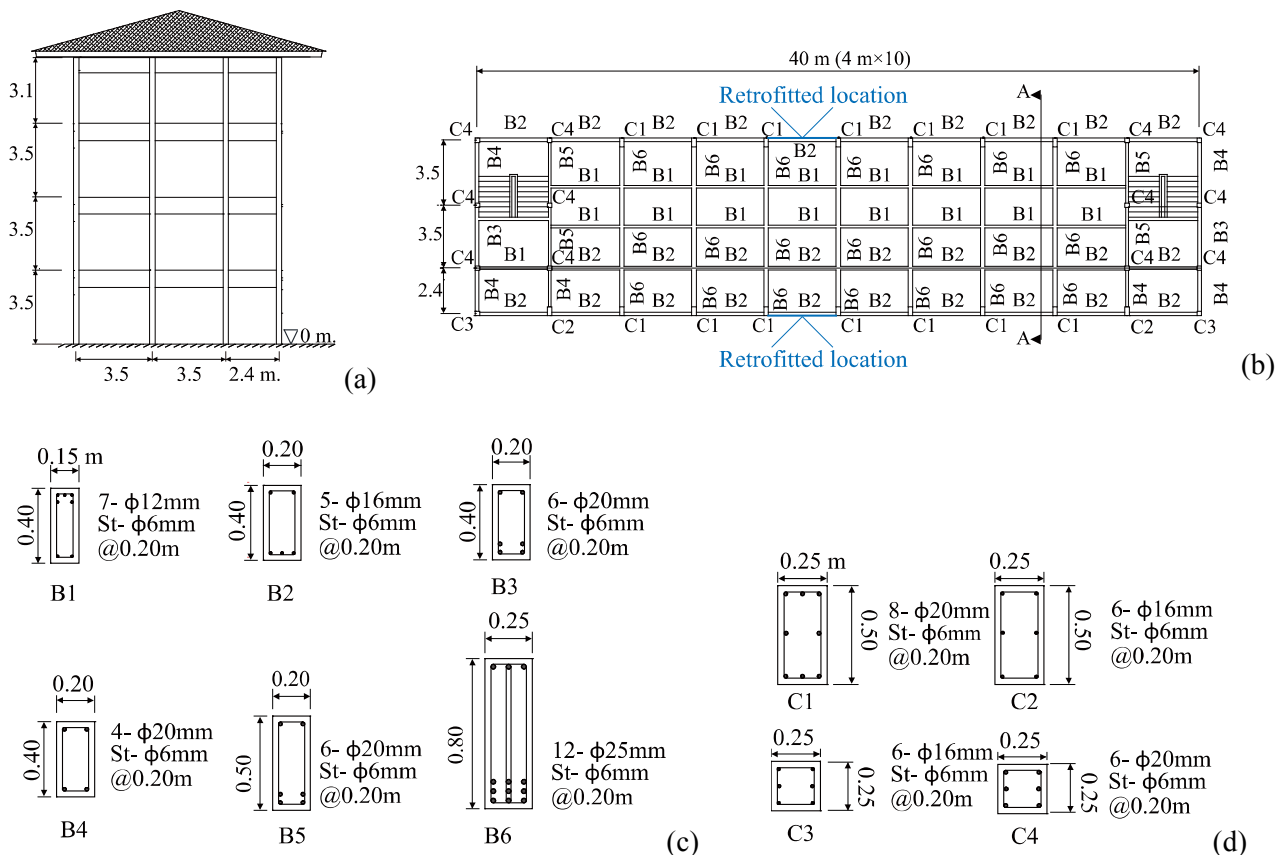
Details of the four-story RC school building (a) Section A-A, (b) Structural plan, (c) Cross-sectional details of the RC beams, and (d) Cross-sectional details of the RC columns
